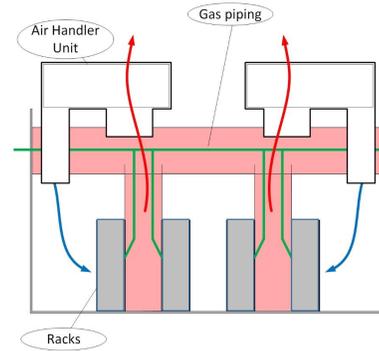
Gas piping can be placed in the hot aisle where air is exhausted out of the building.
